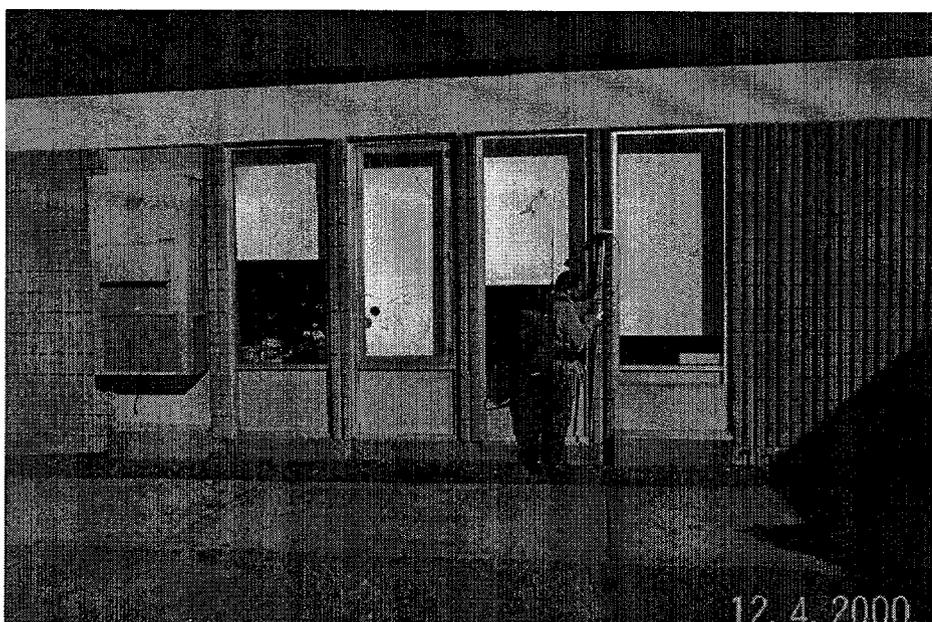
December 2000 Photograph of Survey Indicating Elevation 132.7'
